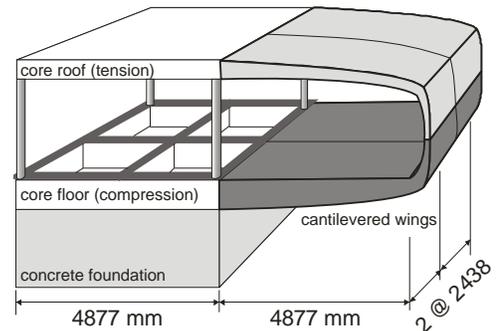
Monocoque modular U-shaped shells cantilevered off foundation.
